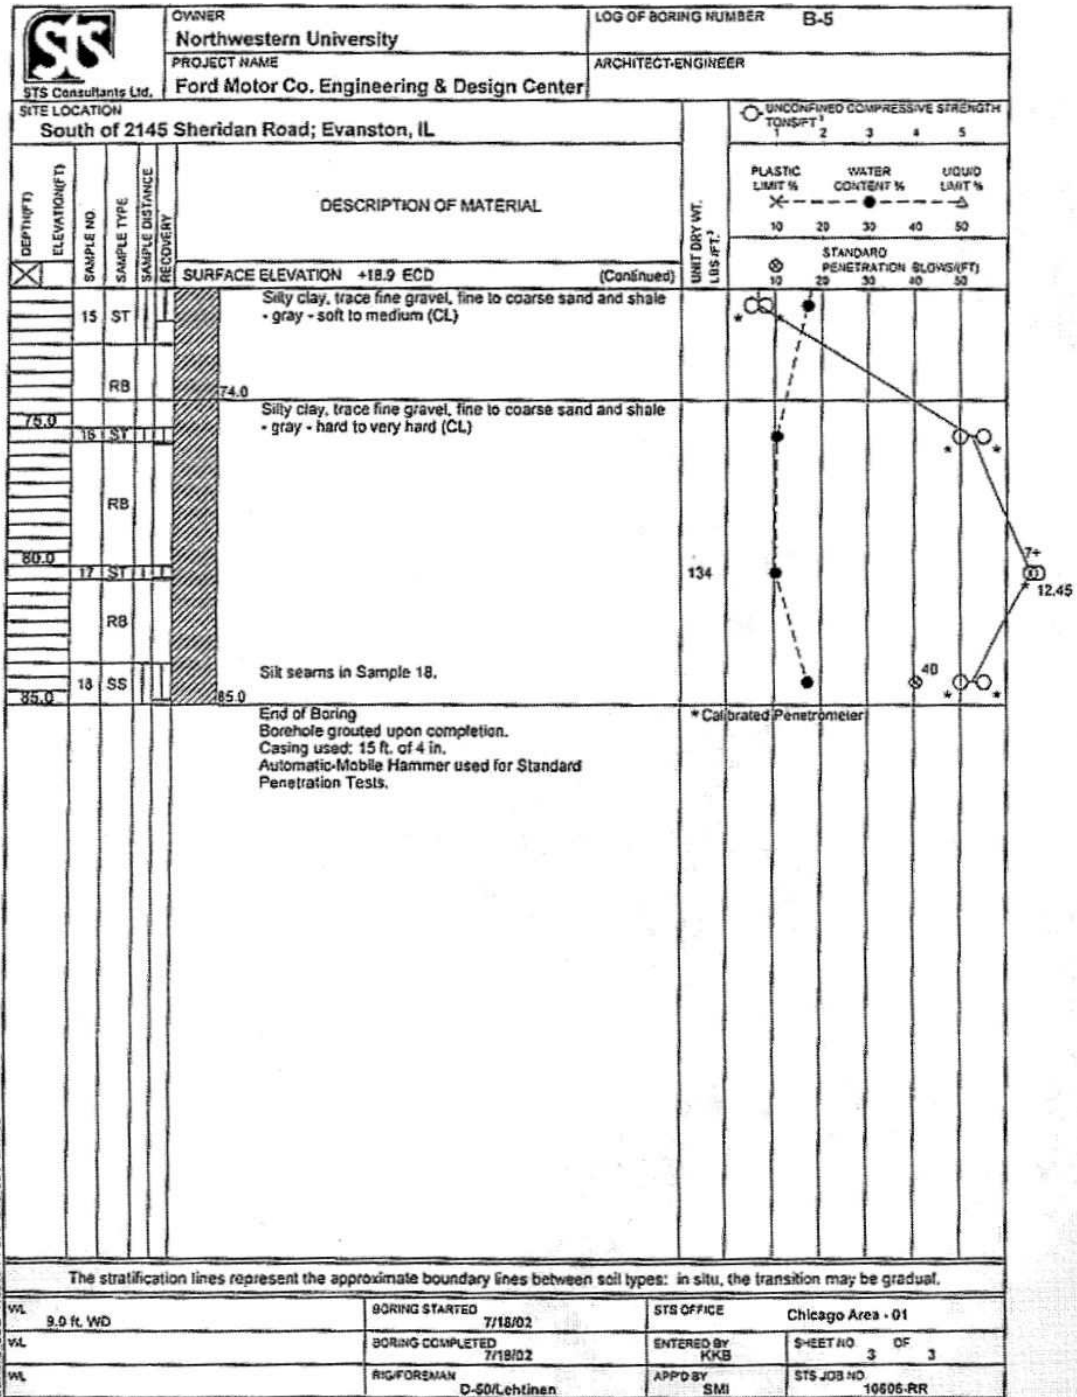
Soil boring record (page 3) provided by Northwestern which was performed at the Ford Design Center test site
